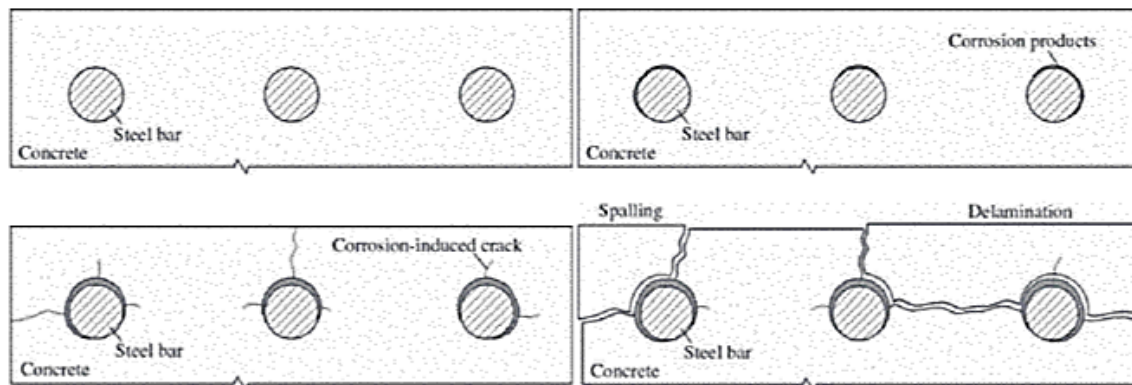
Diagram showing the degradation of structural concrete with corrosion of steel reinforcement [14].
